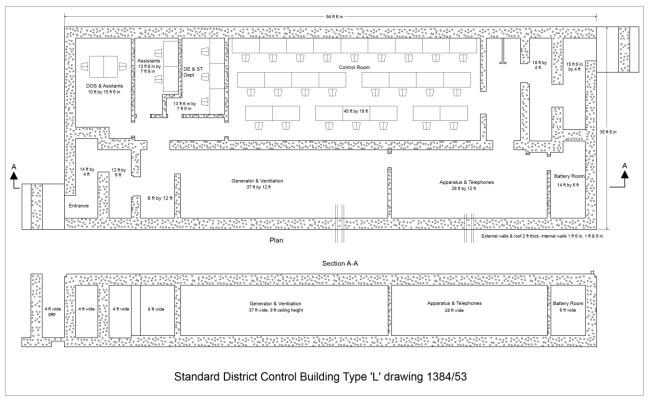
Floor plan of Standard District Control Building Based on drawing 1384-53 plus observations at Bricket Wood
